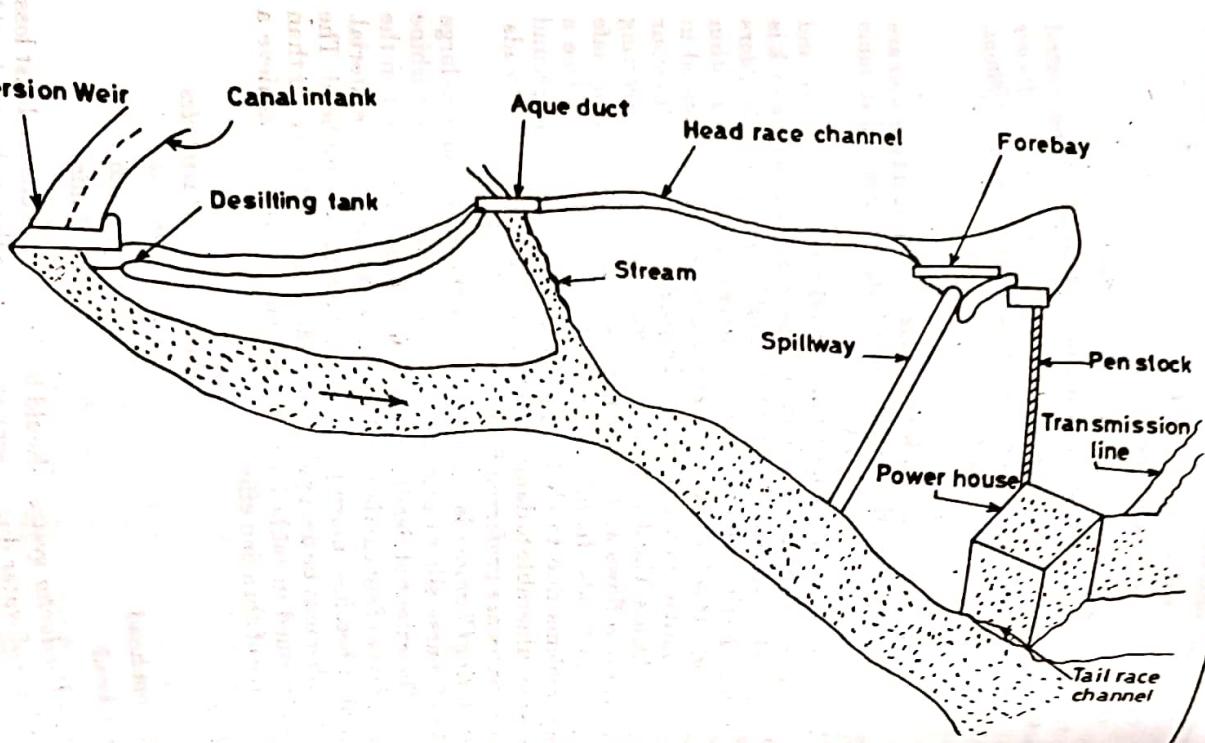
Typical arrangement of small Hydro Power Station.
